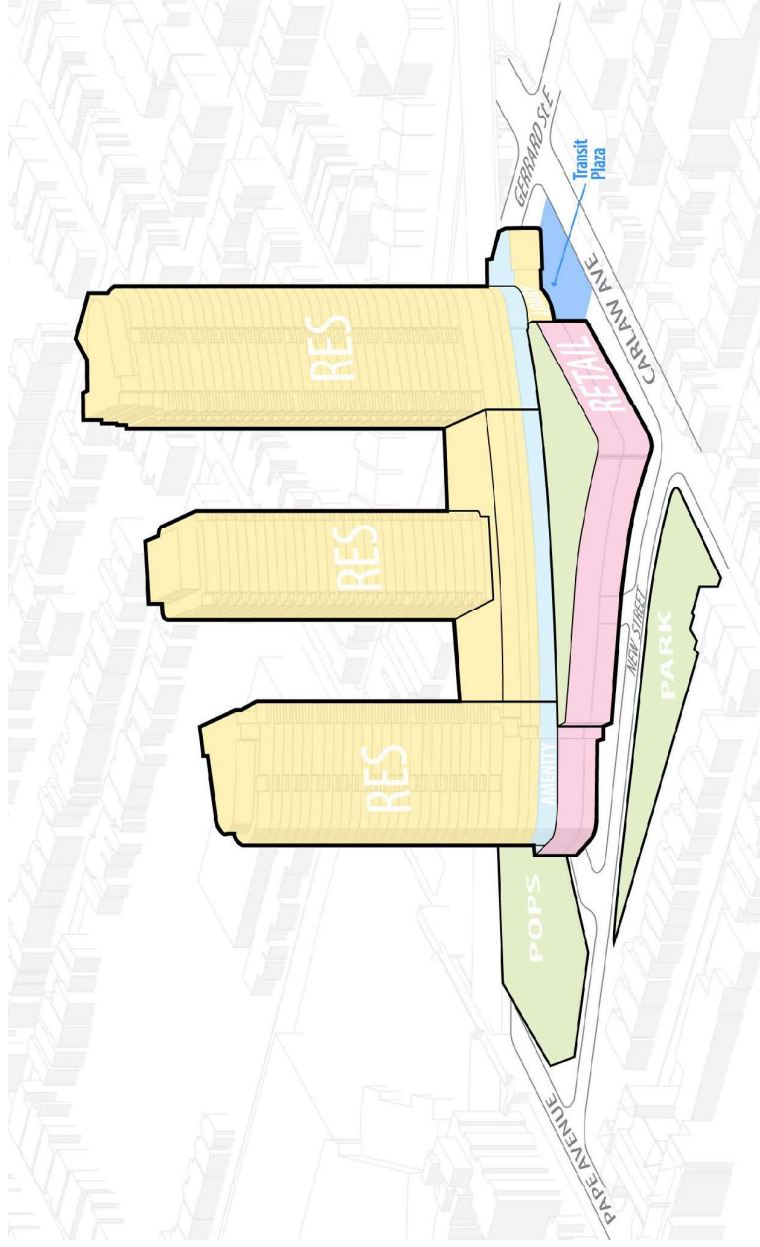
Proposed Development with new park, retail and community uses, and access to transit
